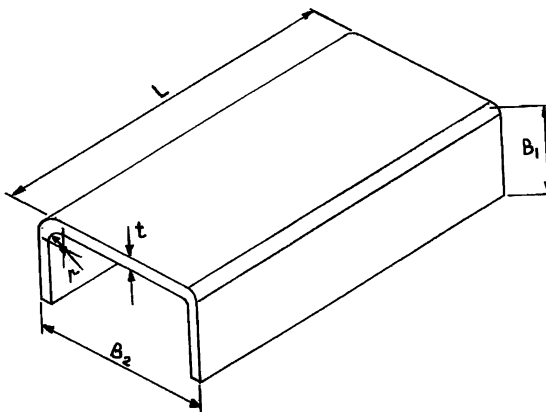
Nominal Dimensions of Short Strut Plain Channel Cold Formed Sections.
